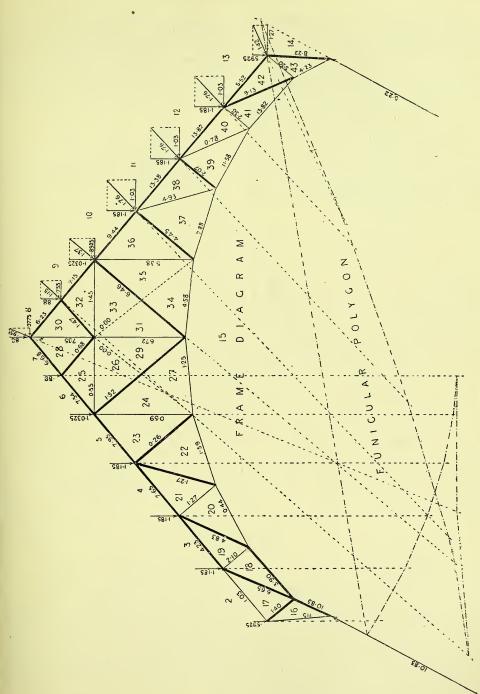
,--Frame Diagram of Roof Truss, 60-ft. Span.
